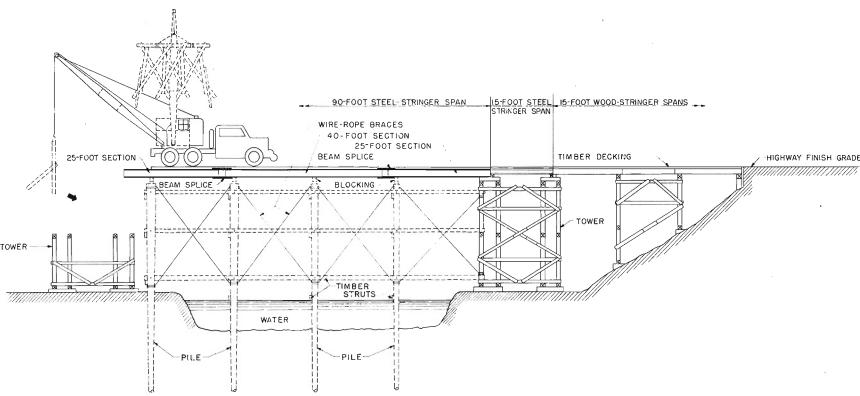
Ninety-foot steel-stringer span on timber towers erected on falsework.
